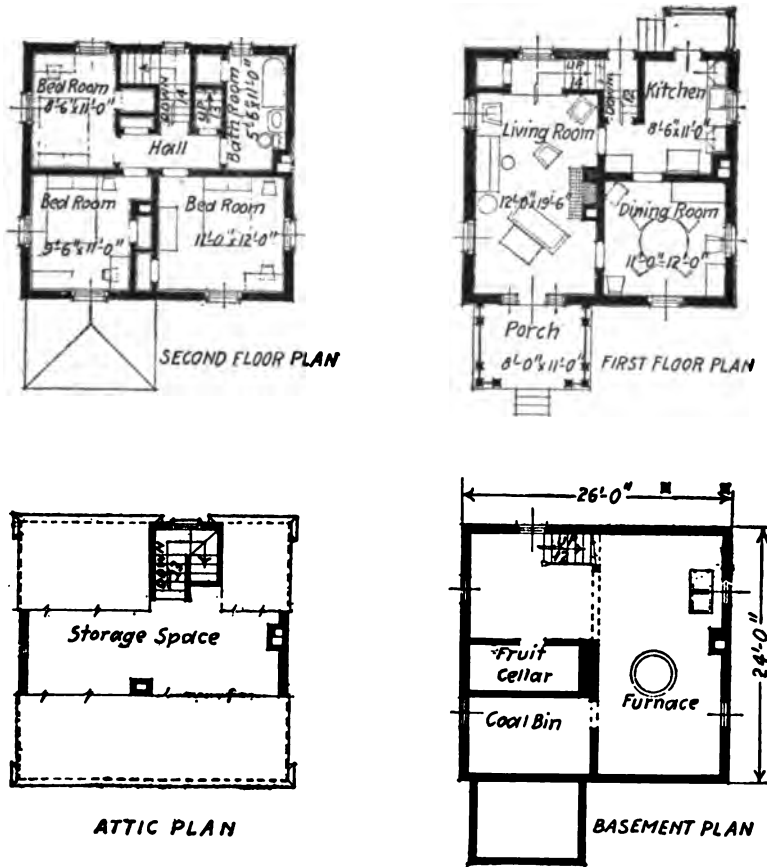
B.—Floor plans of six-room detached dwelling. (See Fig. 44A.)
